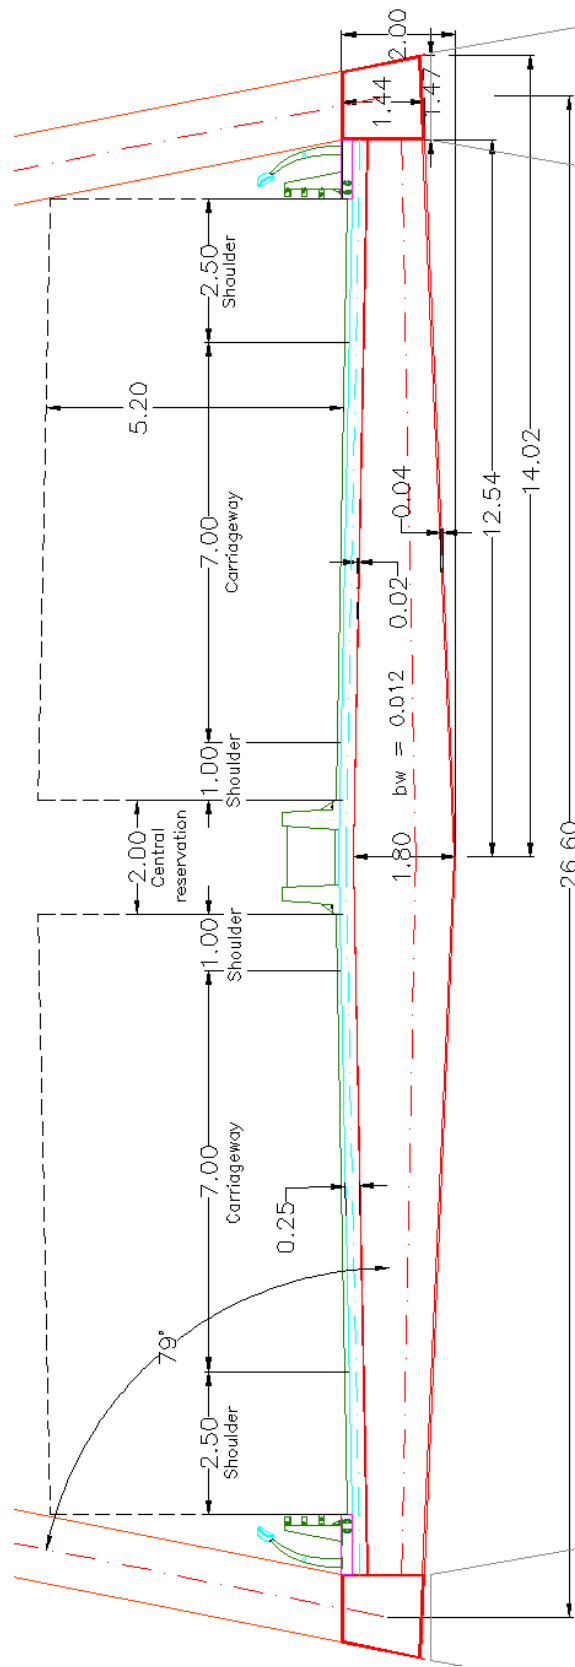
Deck cross-section detailing of the adopted solution (m).
